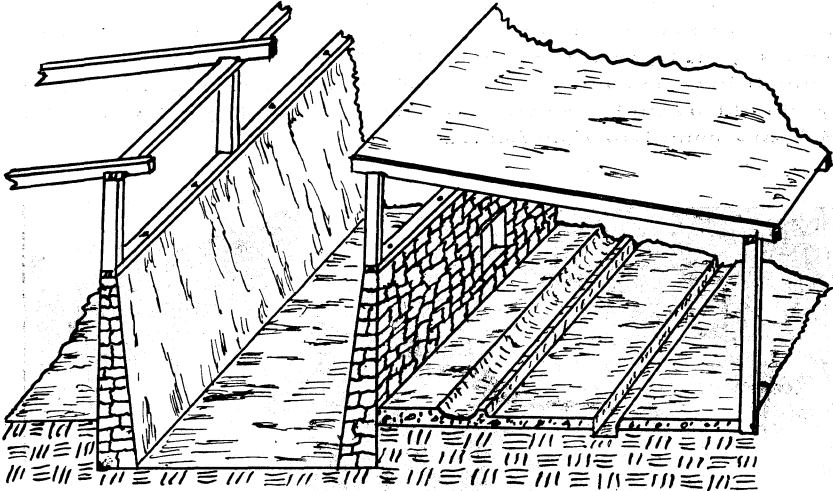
This drawing suggests a method of constructing a trench silo of rock partly or entirely above ground. The walls may be used in connection with sheds for cattle, machinery or other purposes.
